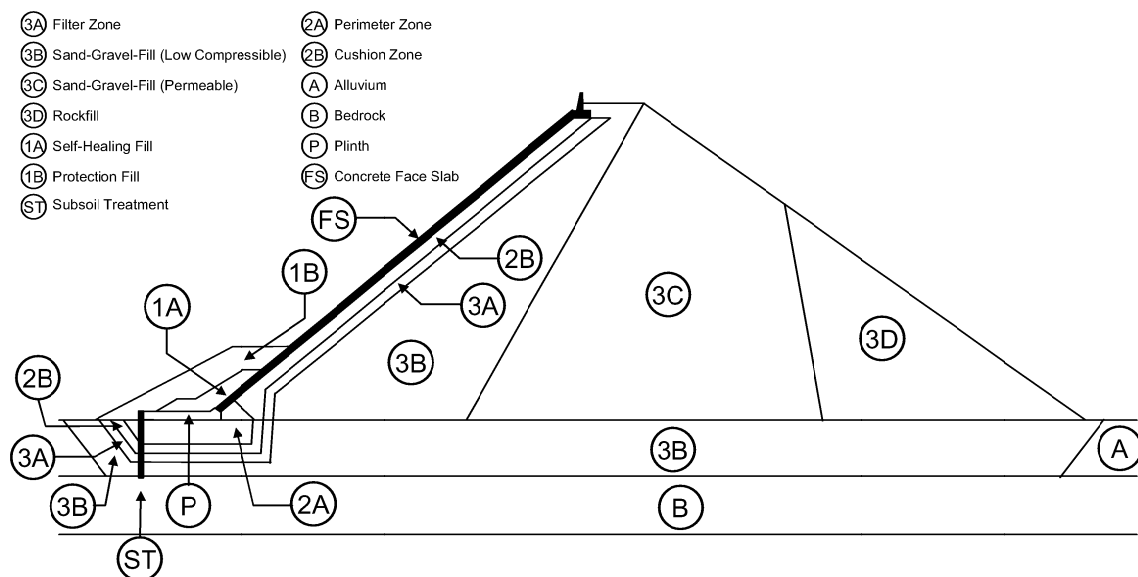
Typical CFSGD section/zoning applying two sand-gravel fills and one rockfill material
